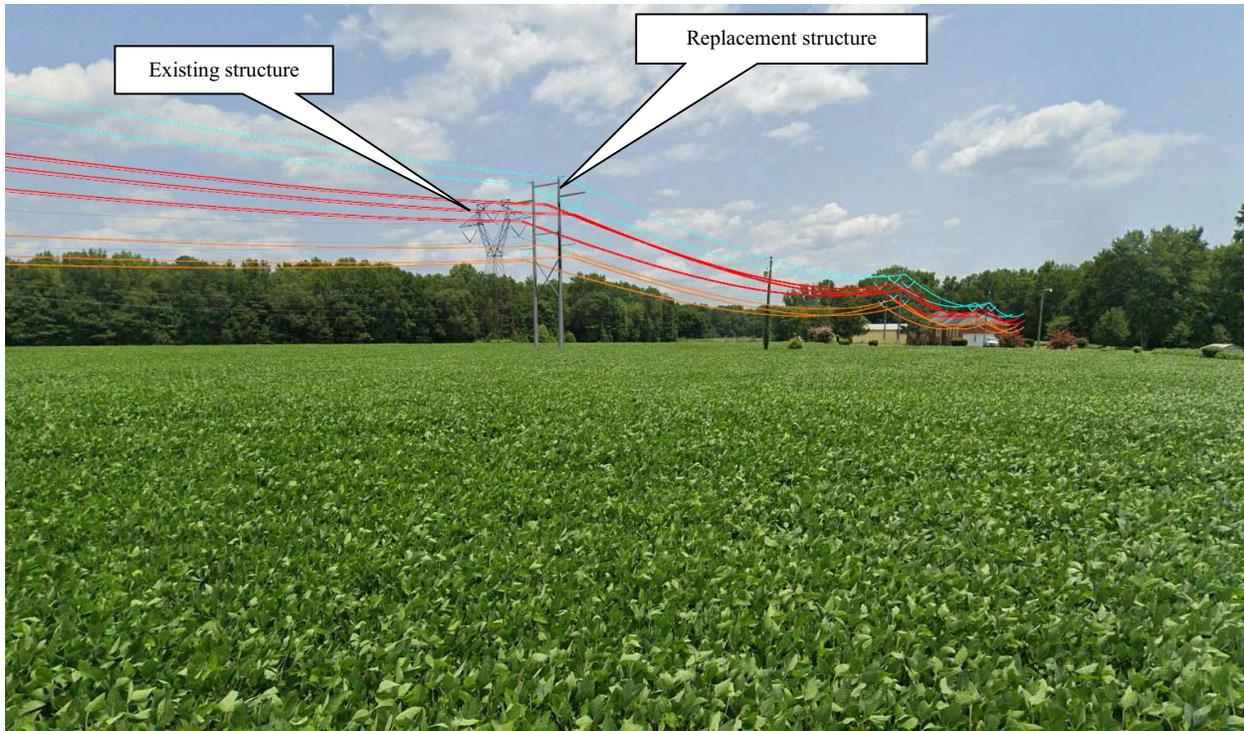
Rendering 1 - model of proposed structures and transmission line from Hope Haven Drive (replacement structure to be of similar height to structure on adjacent line not replaced as part of this project. Source: Google Streetview
